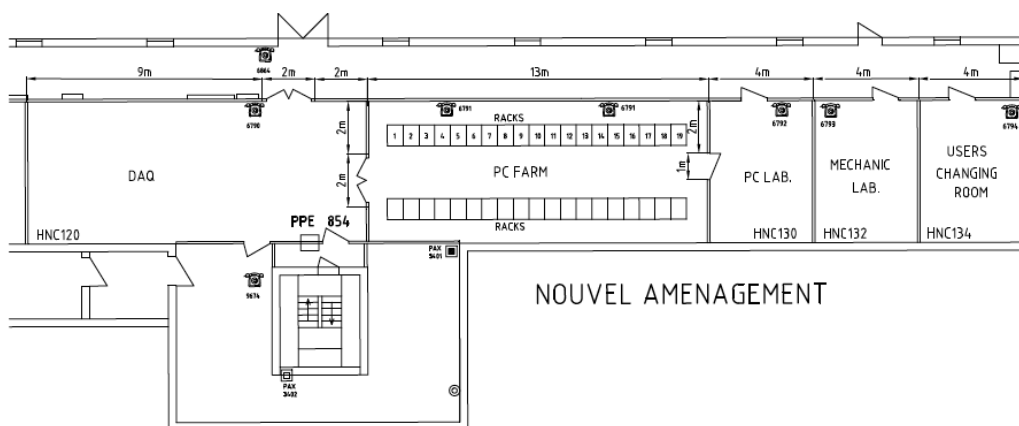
Proposed layout of building 918. The NA62 upstairs computing room will be hosted in a part (approximately one half) of the area formerly used as NA60 control room.
